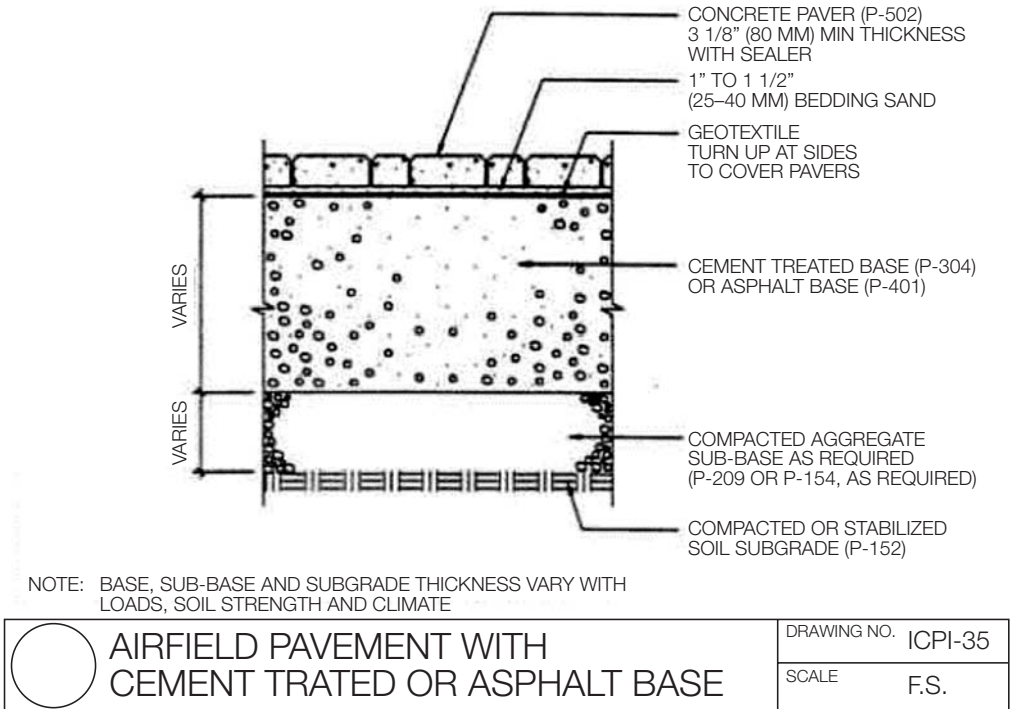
Interlocking concrete paver construction detail for an airfield
